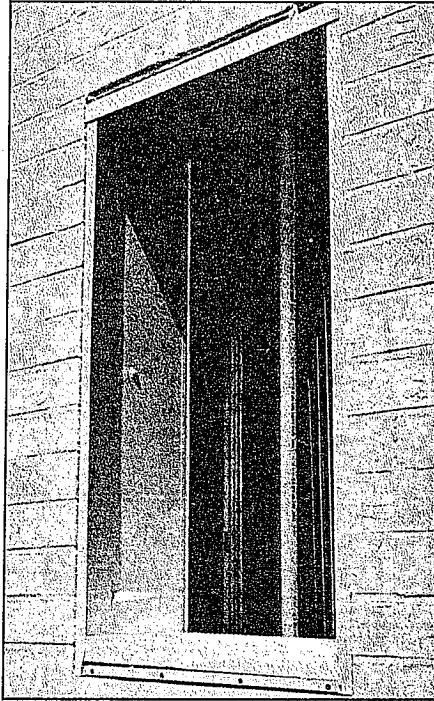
Fasteners shot through wall sleeve sides into block wall.
